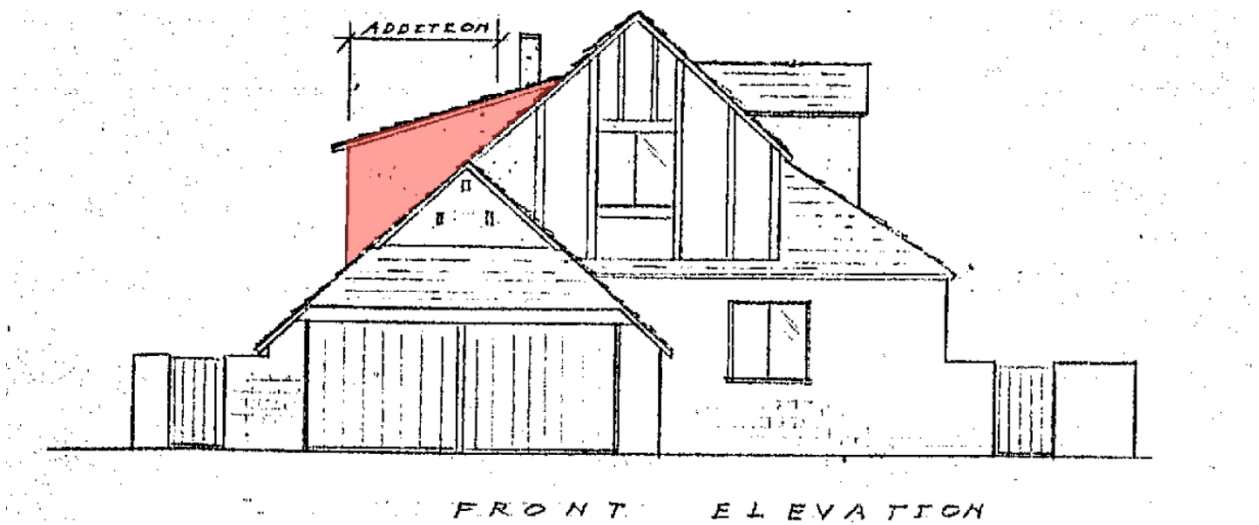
Elevation drawing with the 1973 rooftop addition shaded red.
